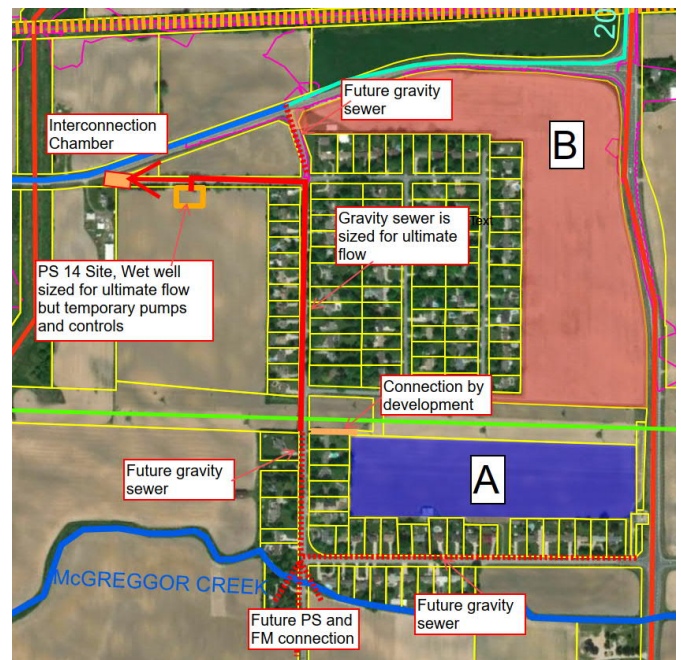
Gravity Sewer Connection to PS 14 and PS 14 and Forcemain Construction (Alternative 4)
